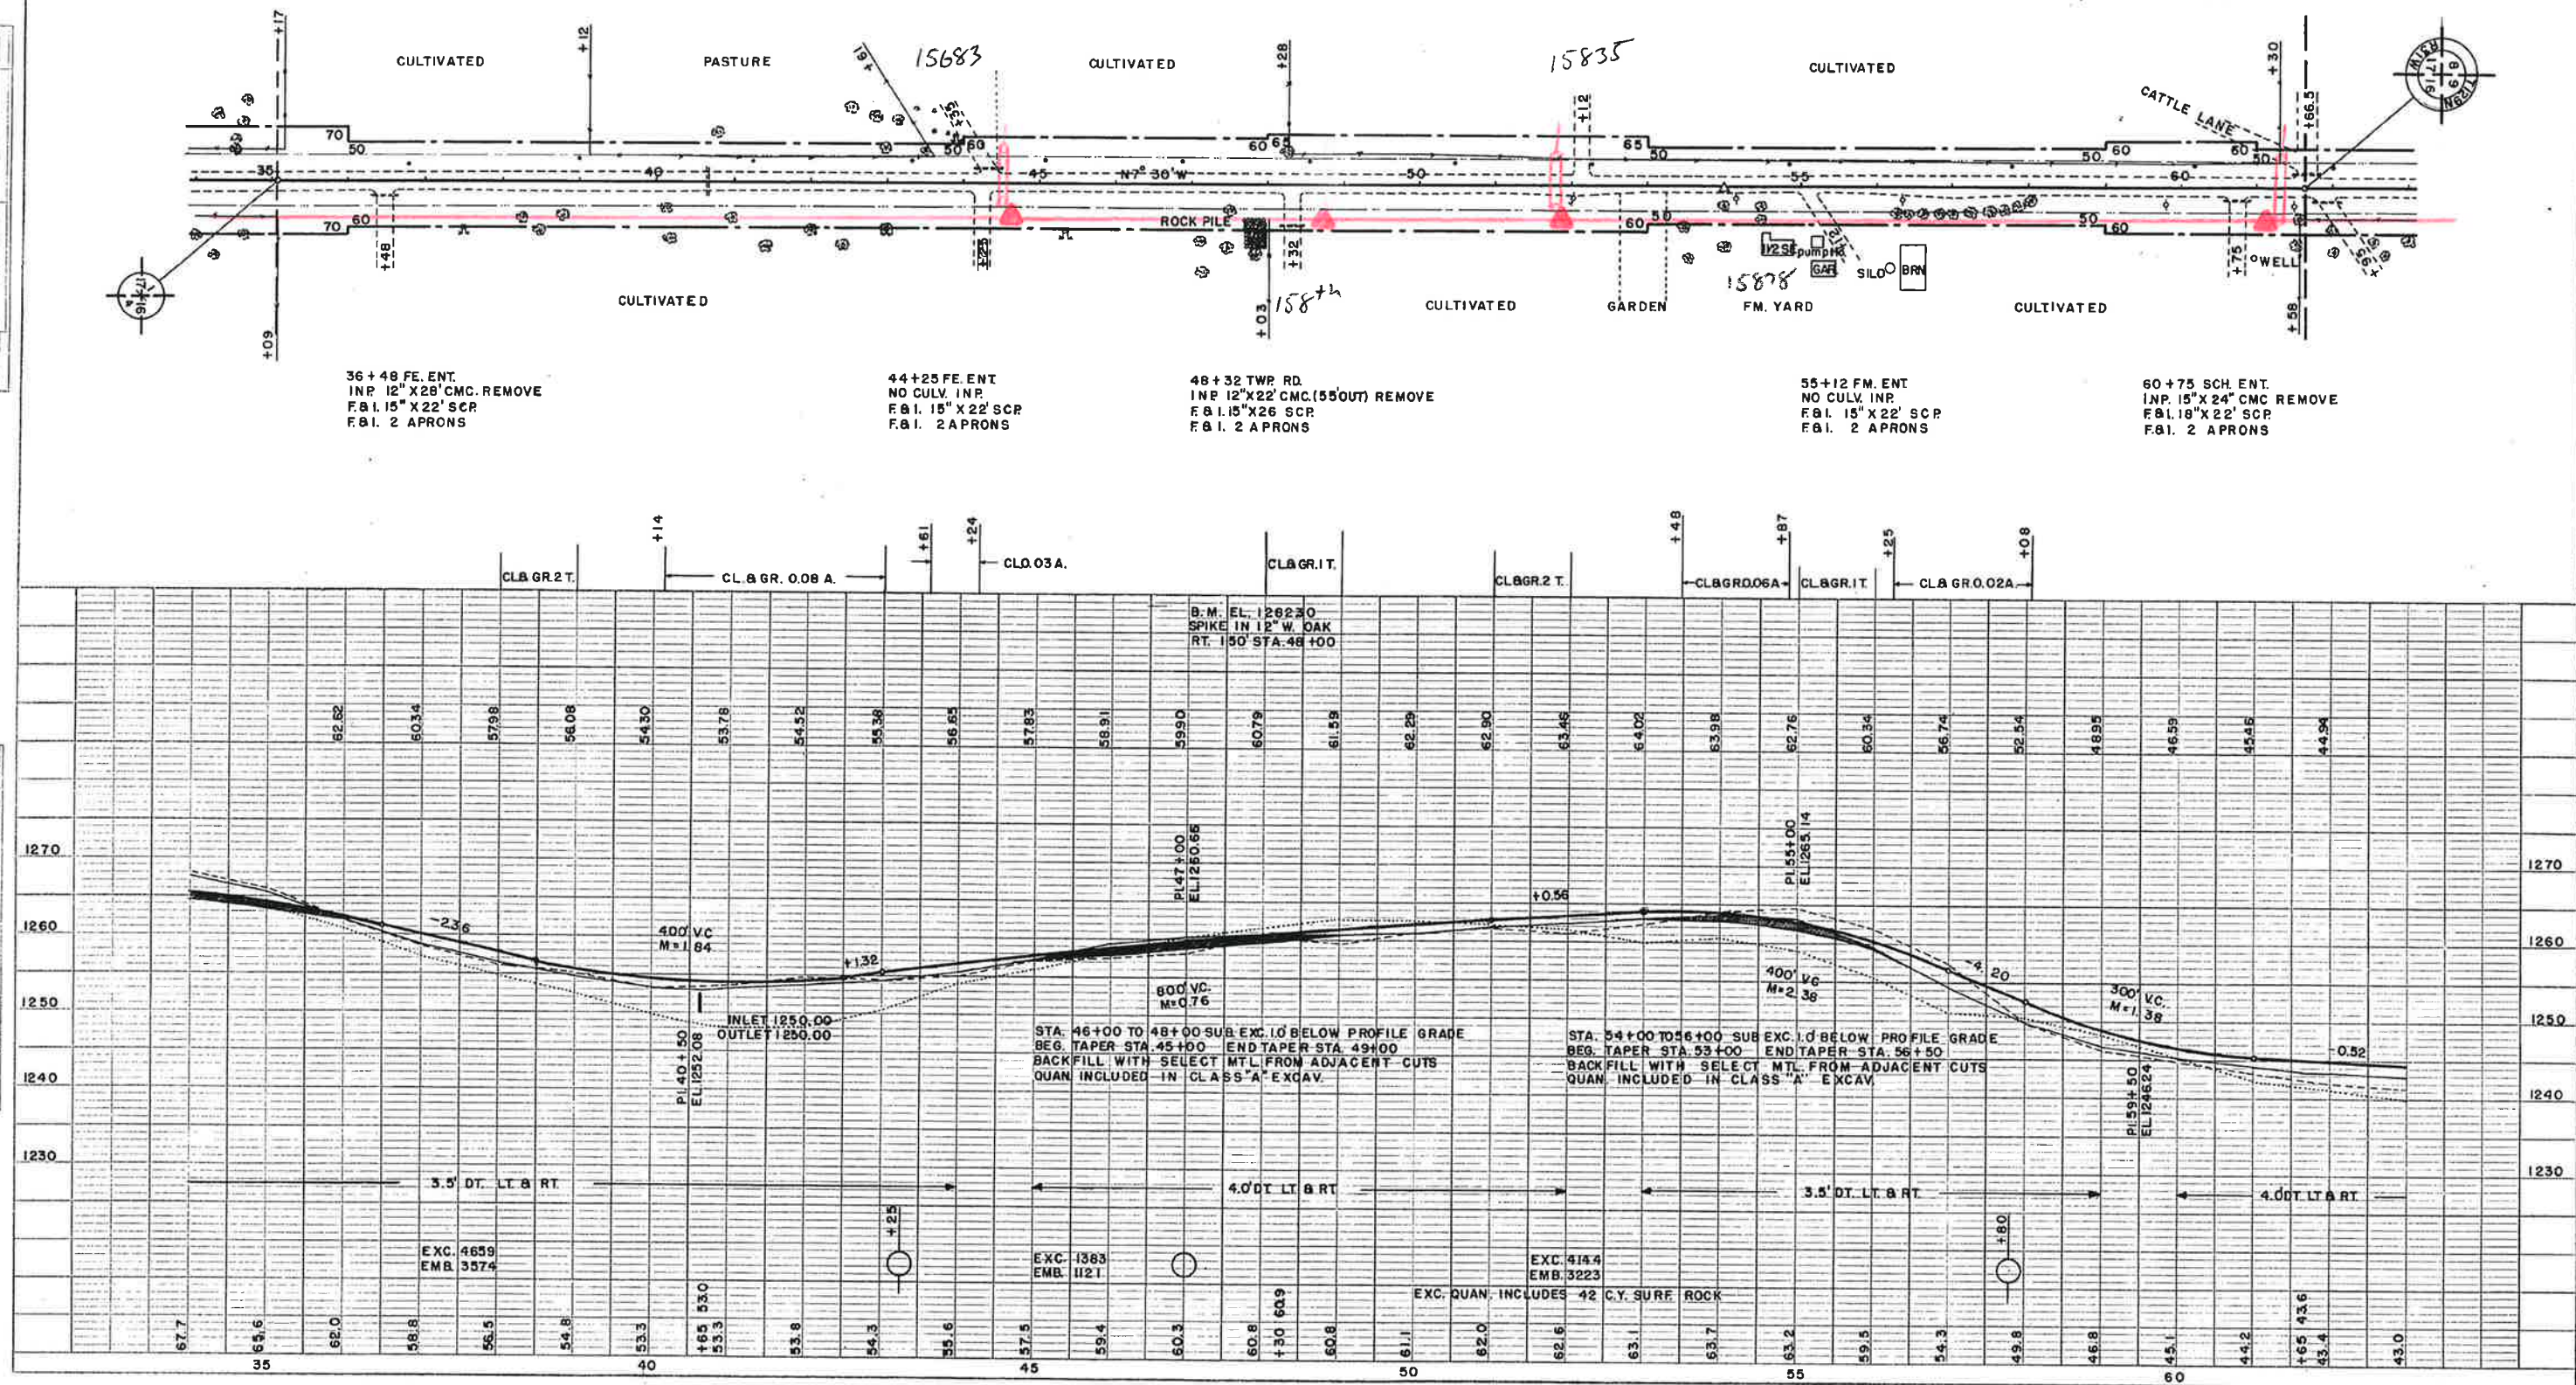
PLAN PROFILE, O.P.R. & R.T. STATIONED
